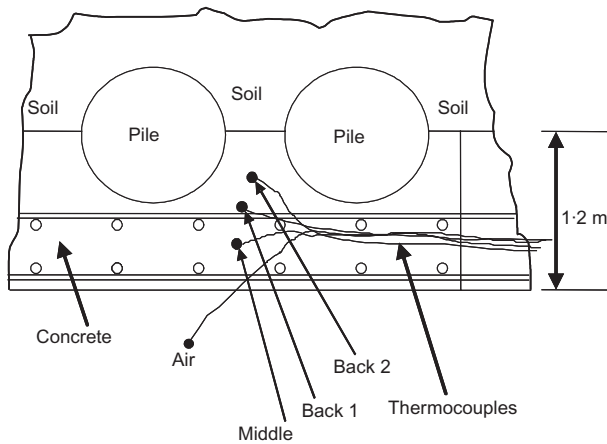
Arrangement of thermocouples in 1.2 m thick tunnel skin wall
